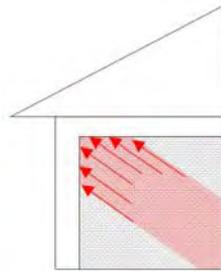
Concentrated loading on tie column-ring beam joint from compression strut
